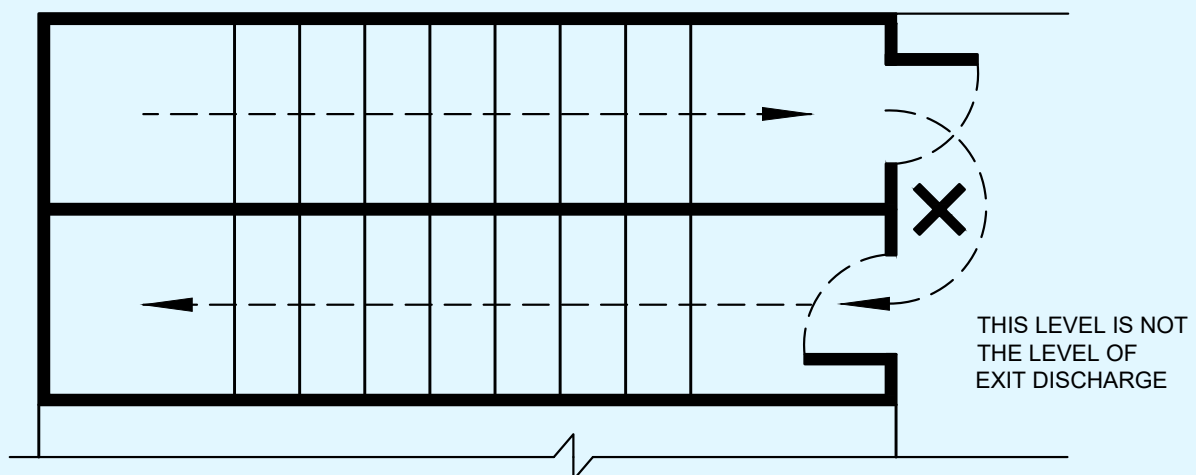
UNACCEPTABLE ARRANGEMENT FOR ENCLOSING A STAIR SERVING AS A REQUIRED EXIT
